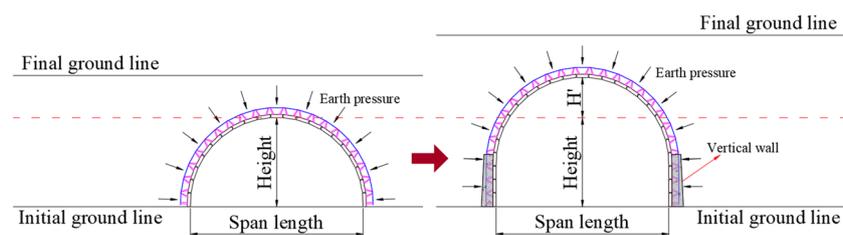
Concept of improved modular underground arch culvert structure with vertical wall
